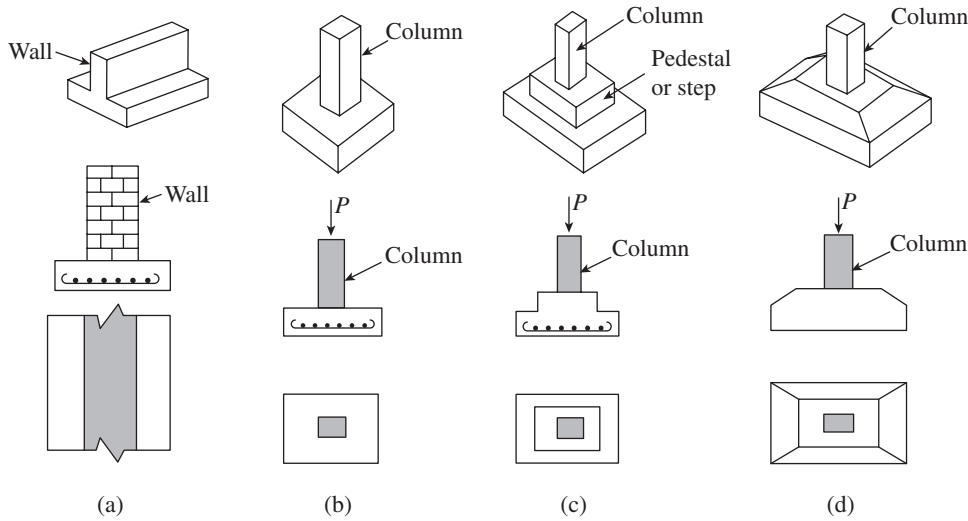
Types of isolated footings (a) Strip or wall footing (b) Spread footing (c) Stepped footing (d) Sloped footing
